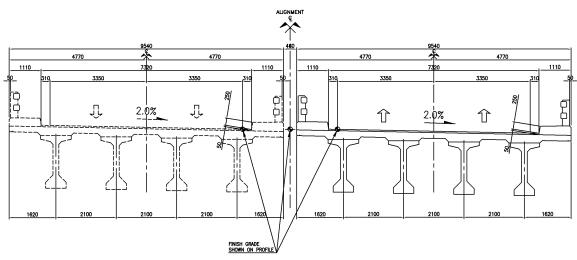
Typical Cross Section of 2 Lane Bridge
